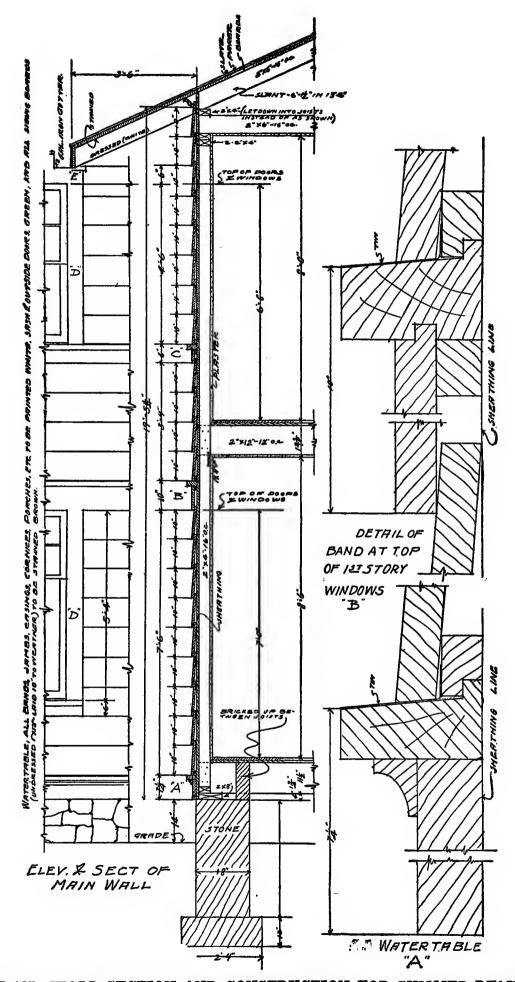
WALL SECTION AND CONSTRUCTION FOR SUMMER RESIDENCE
